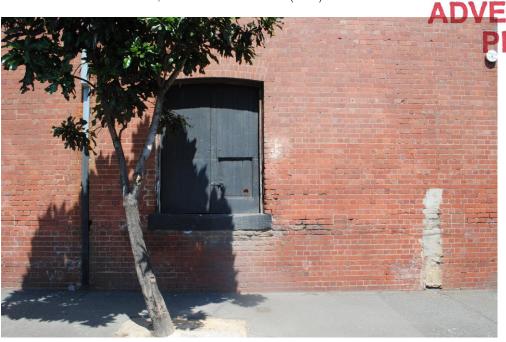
, Goldsborough and Co. later Younghusband P/L Wool and Grain warehouses HO1162, Wool Store no.3 – Tallow Store, Elizabeth Street facade loading bay door. (2020)
